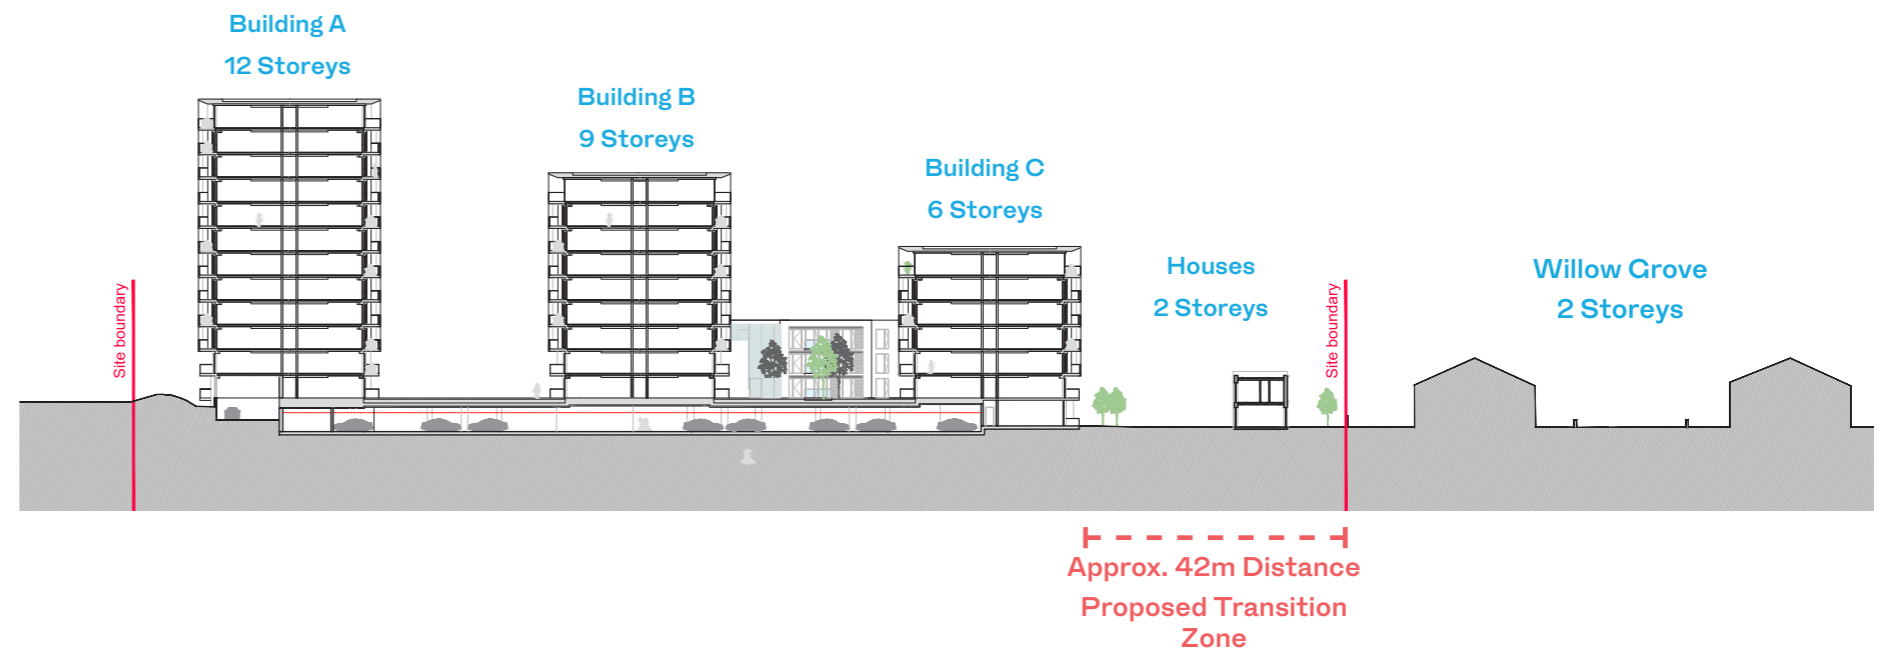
Proposed Residential Development at Cornelscourt - Building Heights Section
